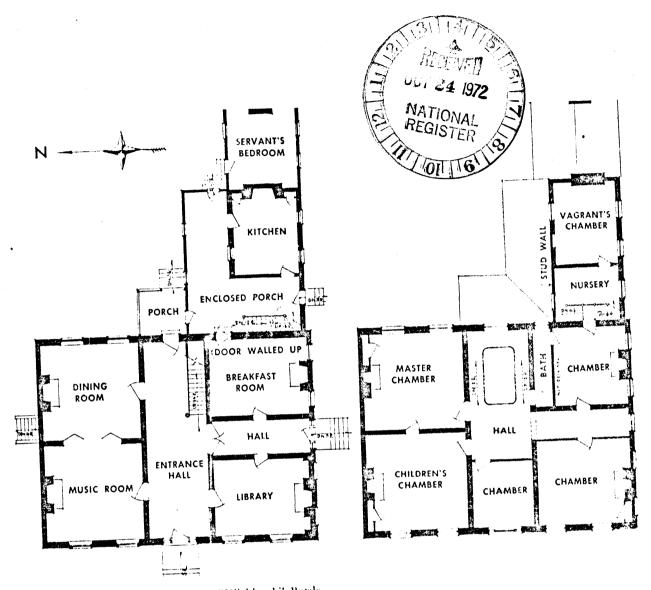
First- and second floor plans, "Wickland," Bardstown.
